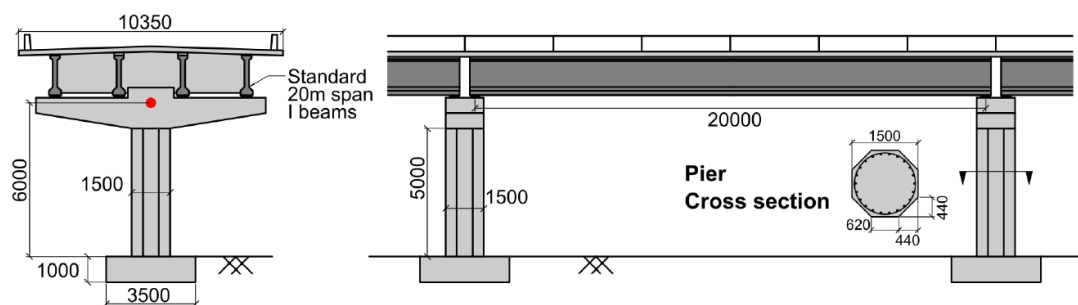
Shows the general layout of the prototype bridge pier (Liu, 2018).
